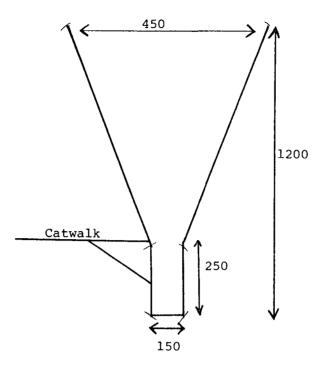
Cross section of handling race. The entire race is enclosed within a darkened tunnel.
